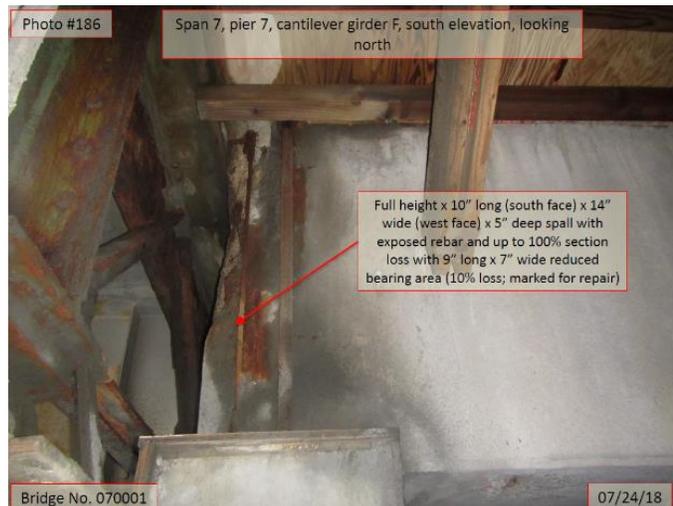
DEEP SPALLING AND EXPOSED REBAR, SPAN 7
